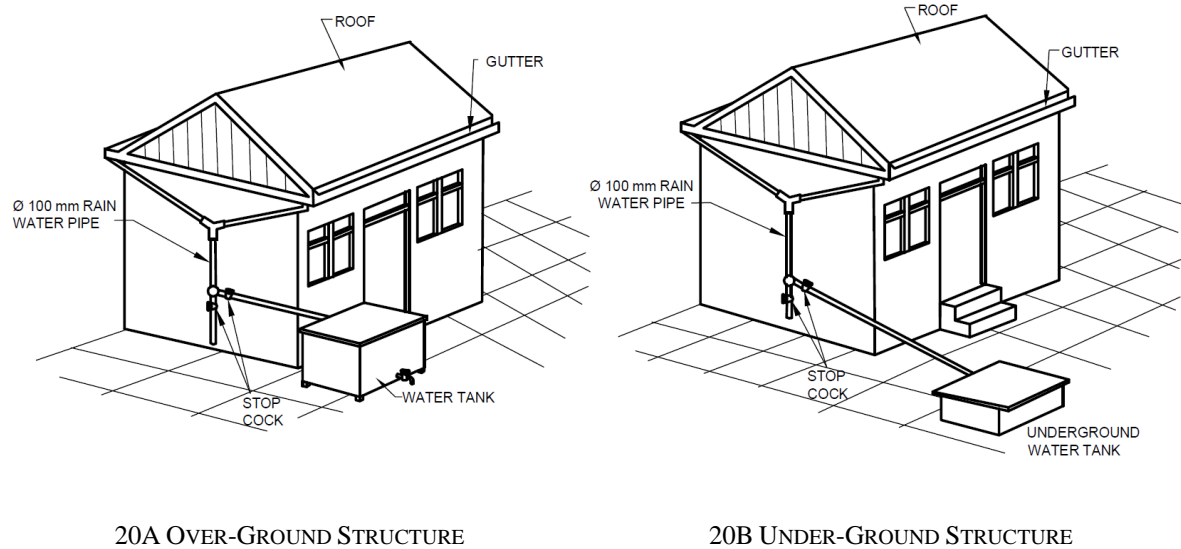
TYPICAL ROOF WATER COLLECTION STRUCTURE
